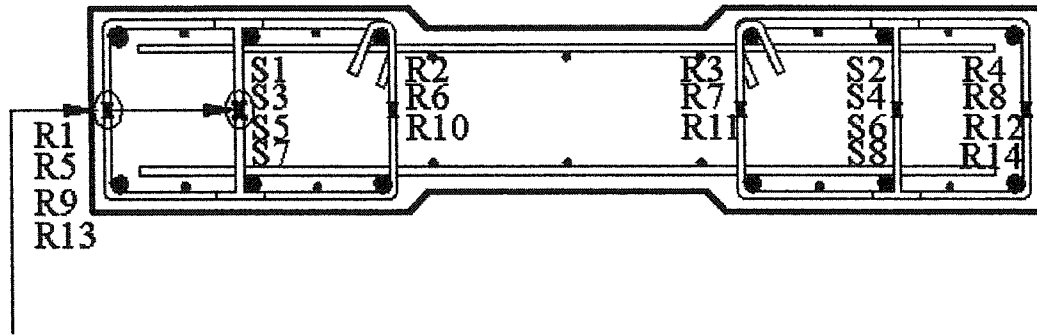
(b) W-3 Strain gauge layout in west elevation
